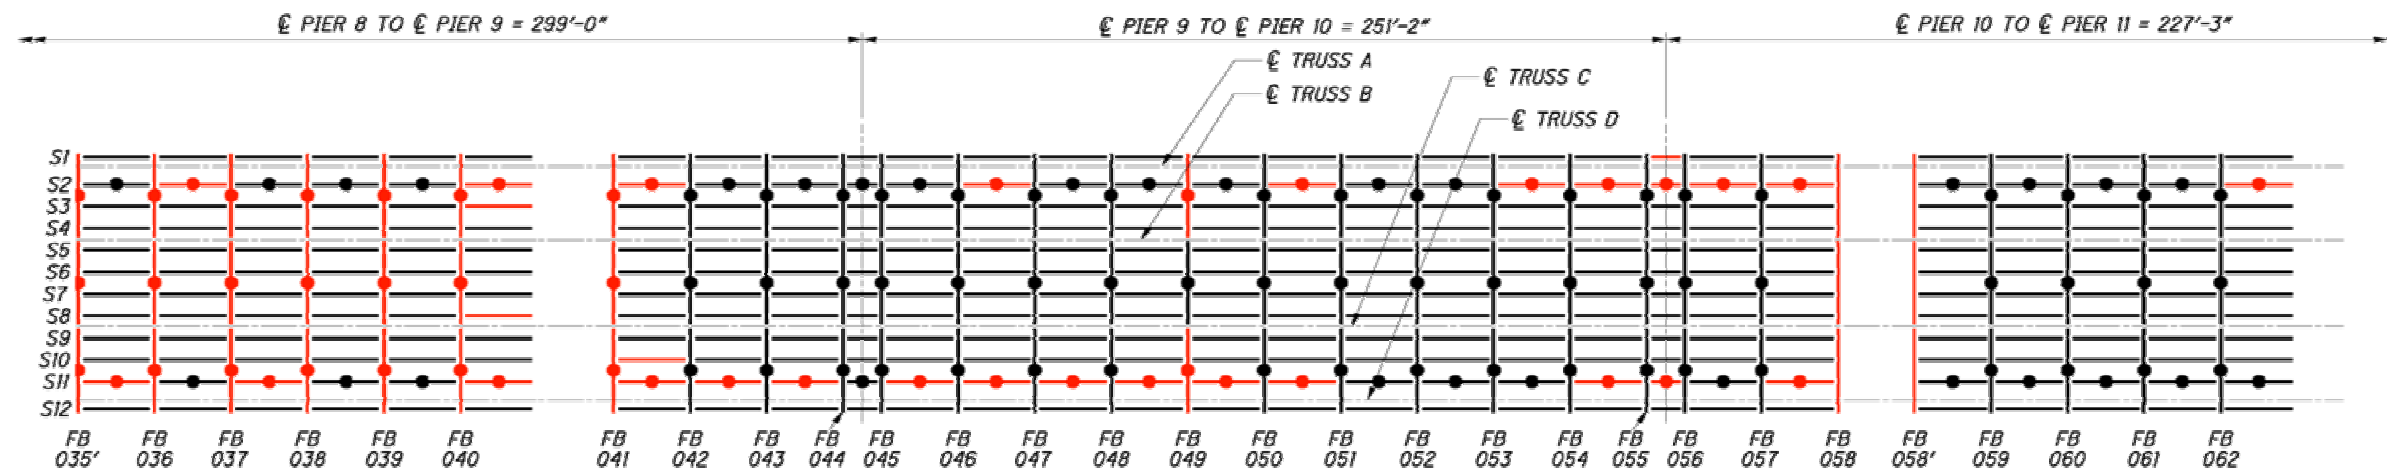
Framing Plan and Elevation of Spans 6 to 8.
